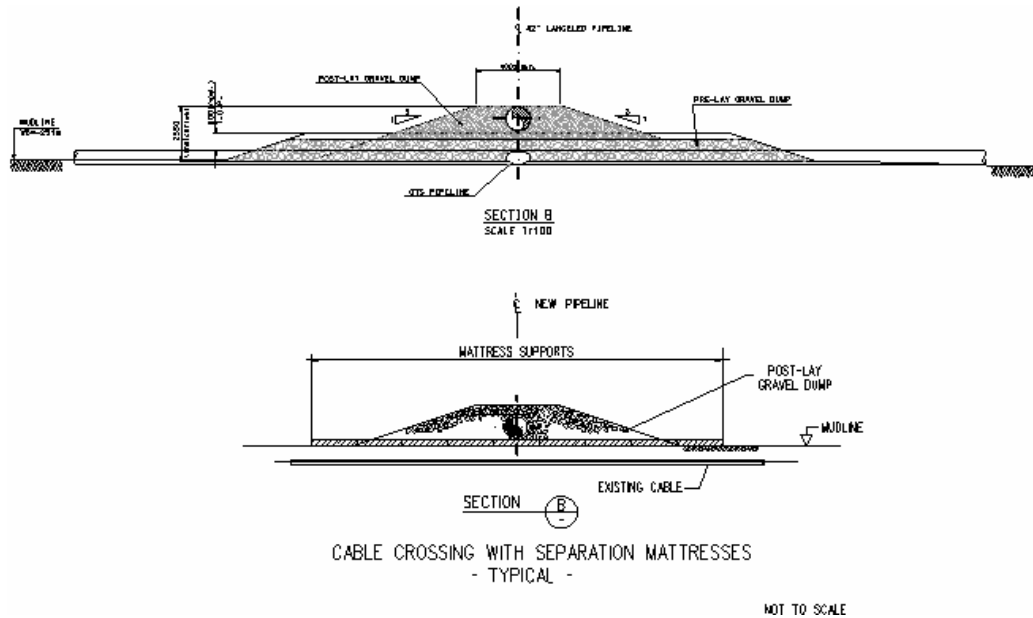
Section through the UK and Norwegian pipeline crossings
